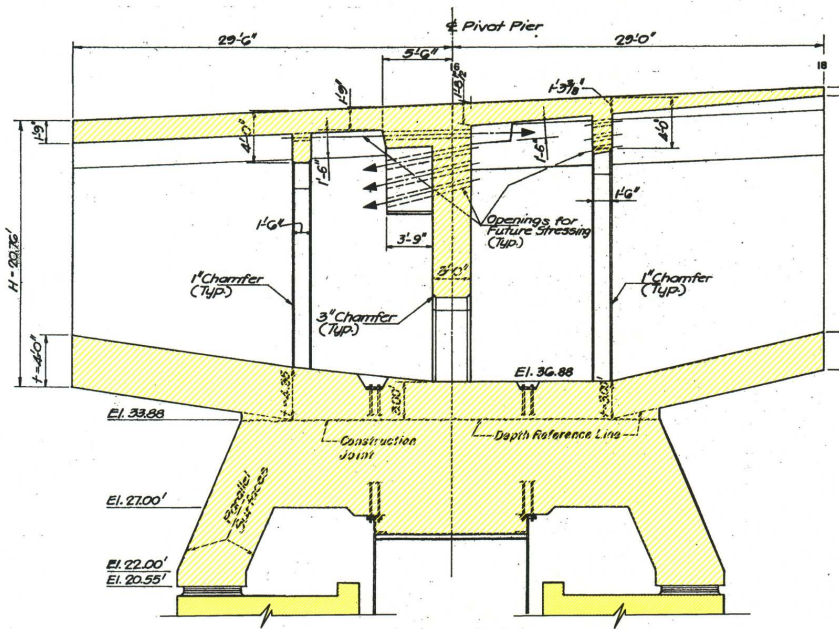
LONGITUDINAL SECTION THROUGH PIVOT PIER
